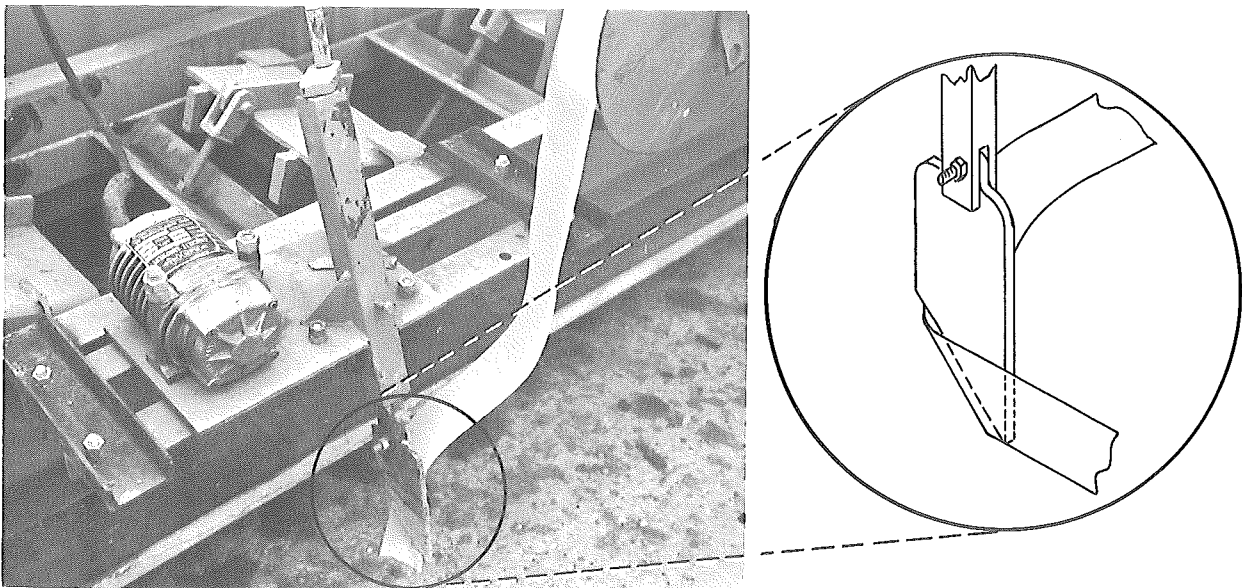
Polyethylene center strip installation device. A 1,000-ft roll of the plastic strip is placed on the reel (upper right) and fed through the hollow guide of the installation tool (center). The drawing shows how the strip is bent at a 90-degree angle in order to trail vertically behind the machine. The friction between the concrete and the strip holds it in position and it is embedded as the finisher moves forward. The concrete is consolidated by the vibrator mounted on the base plate of the device as shown at left in the photograph.
